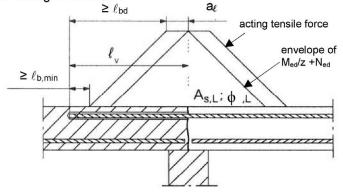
Overlapping joint for rebar connections of slabs and beams
